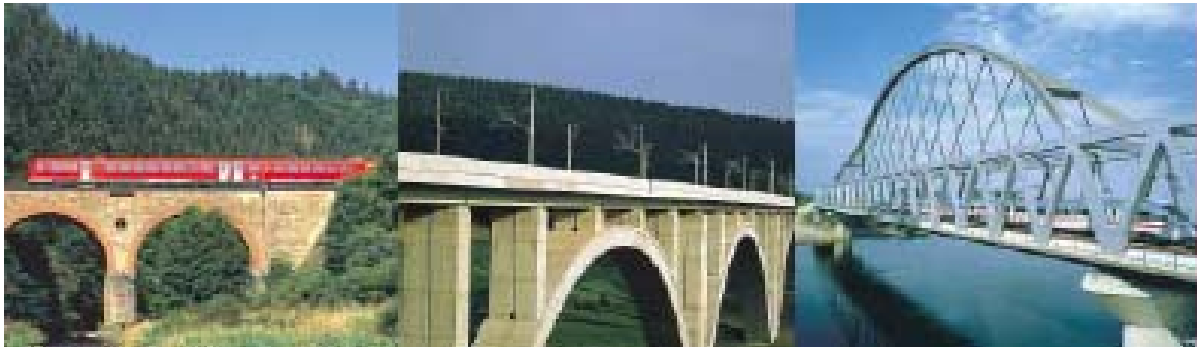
Three types of existing railway bridges being studied: Masonry Arches, Steel Beams supported by Reinforced Concrete Arches and a Steel Truss carried by a Steel Arch.
